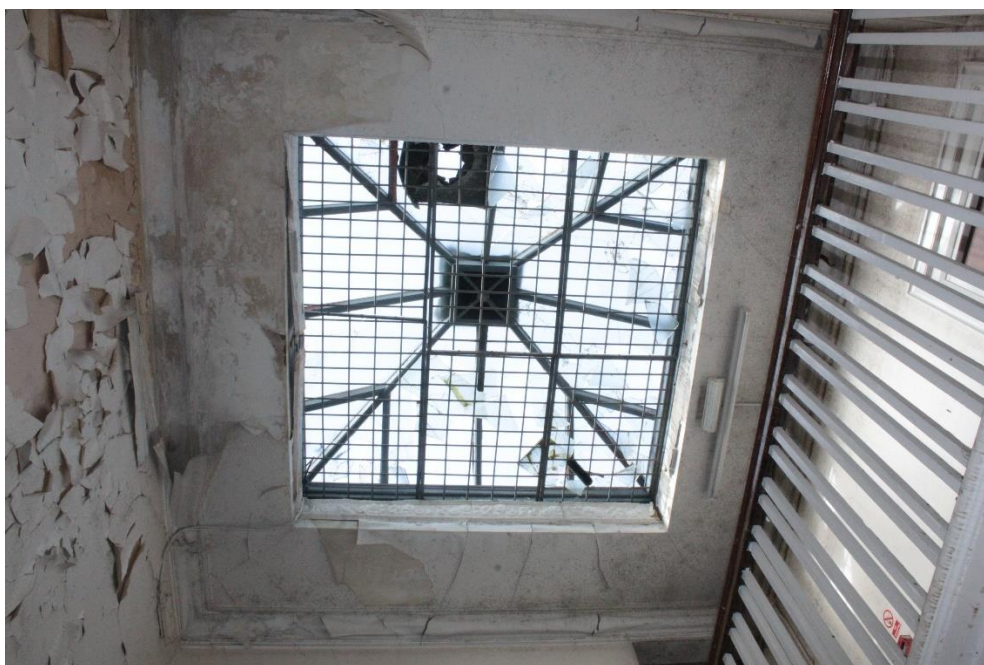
The damaged glazed lantern over the internal stair well.
